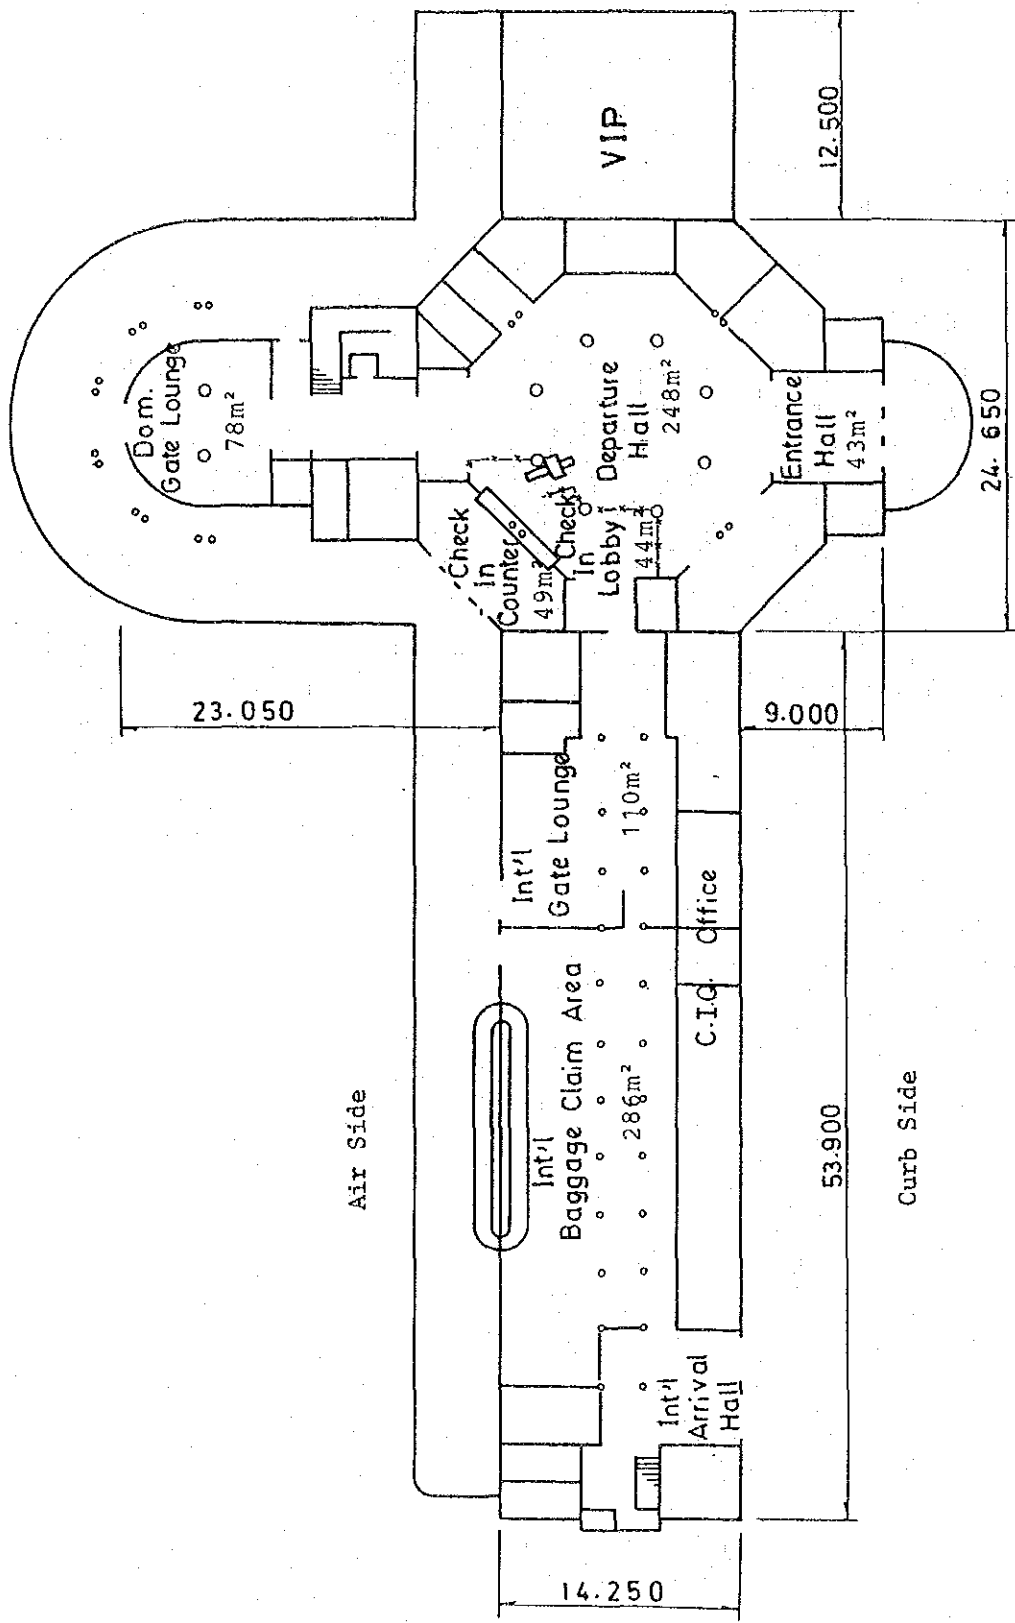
Existing Layout of Passenger Terminal Building (Ground Floor)
